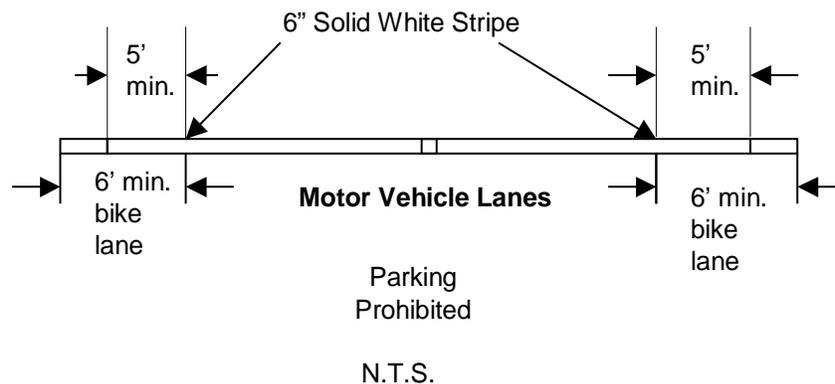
BIKE LANE ON 2-LANE OR MULTI-LANE HIGHWAY –TYPICAL SECTION
